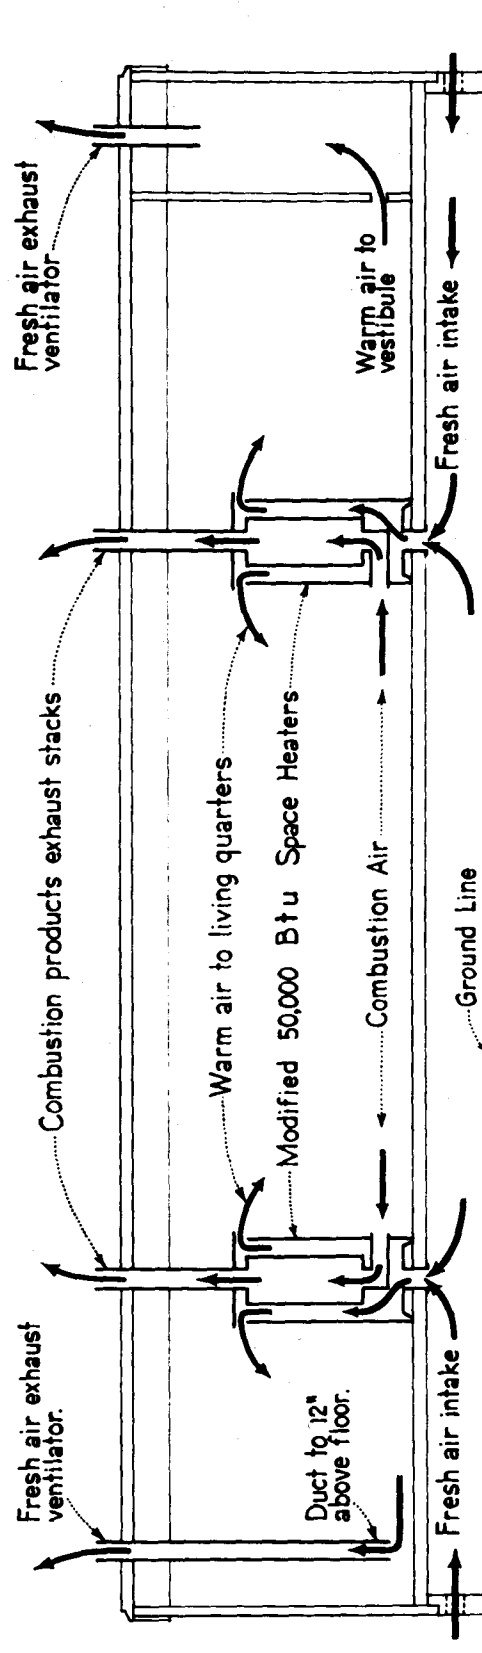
DIAGRAM OF HEATING AND VENTILATING SYSTEM INSTALLED
